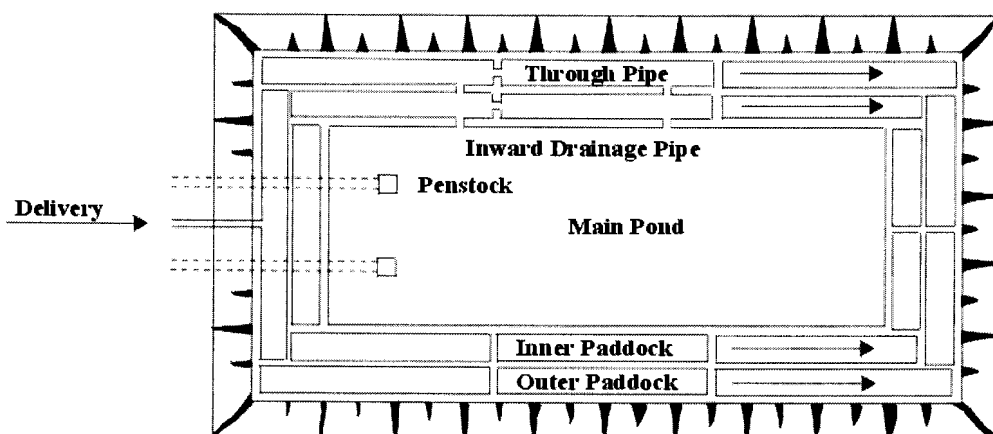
Typical layout of a tailings dam (after Adamson, 1973).
